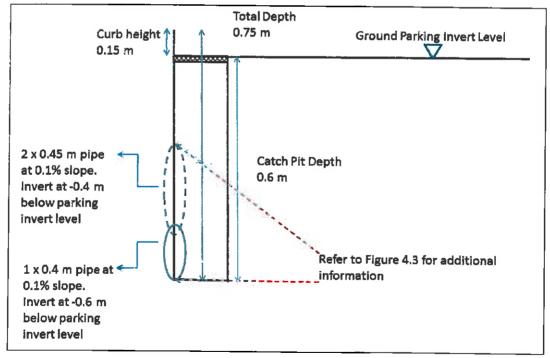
Conceptual Long Section Schematic of the Ground Level Catch Pit and the Stormwater Diversion Pipes.
